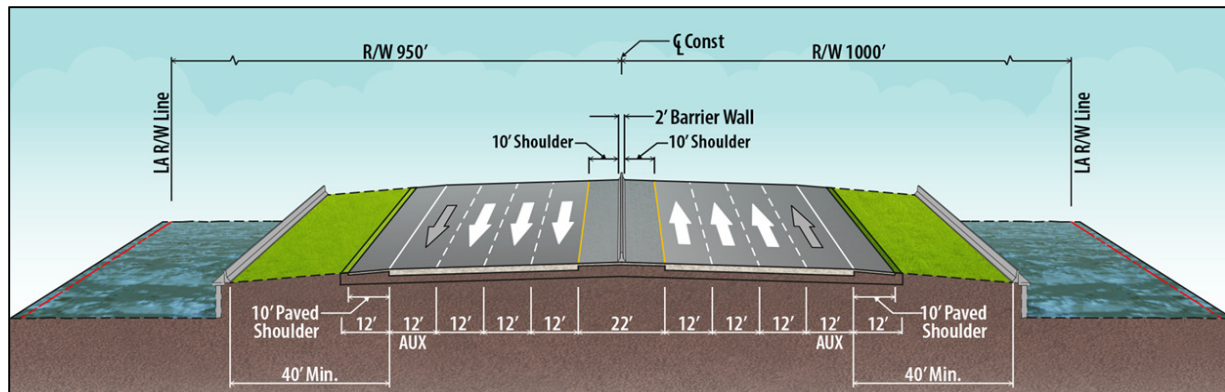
Existing I-275 Mainline Typical Section from south of 4th Street North to 1.0 mile south of Howard Frankland Bridge (Segment C-4)
